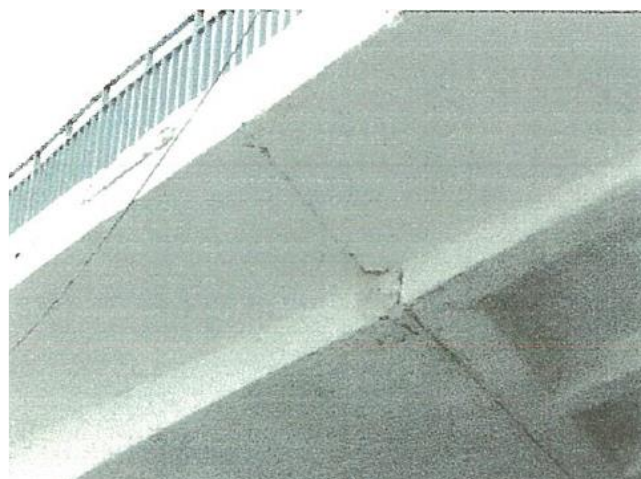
Desk ceiling, damaged joint between simple beam slab and arch slab, local corrosion of bars
